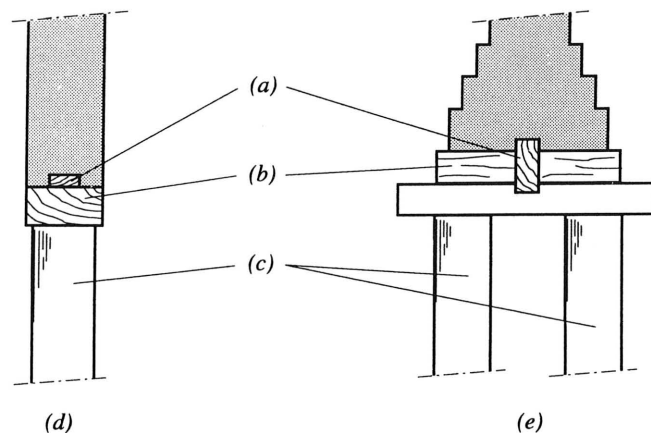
Two commonly used foundation methods. (a) Shear block, (b) foundation slab, (c) pile head, (d) type traditionally used in Rotterdam, (e) type traditionally used in Amsterdam.
